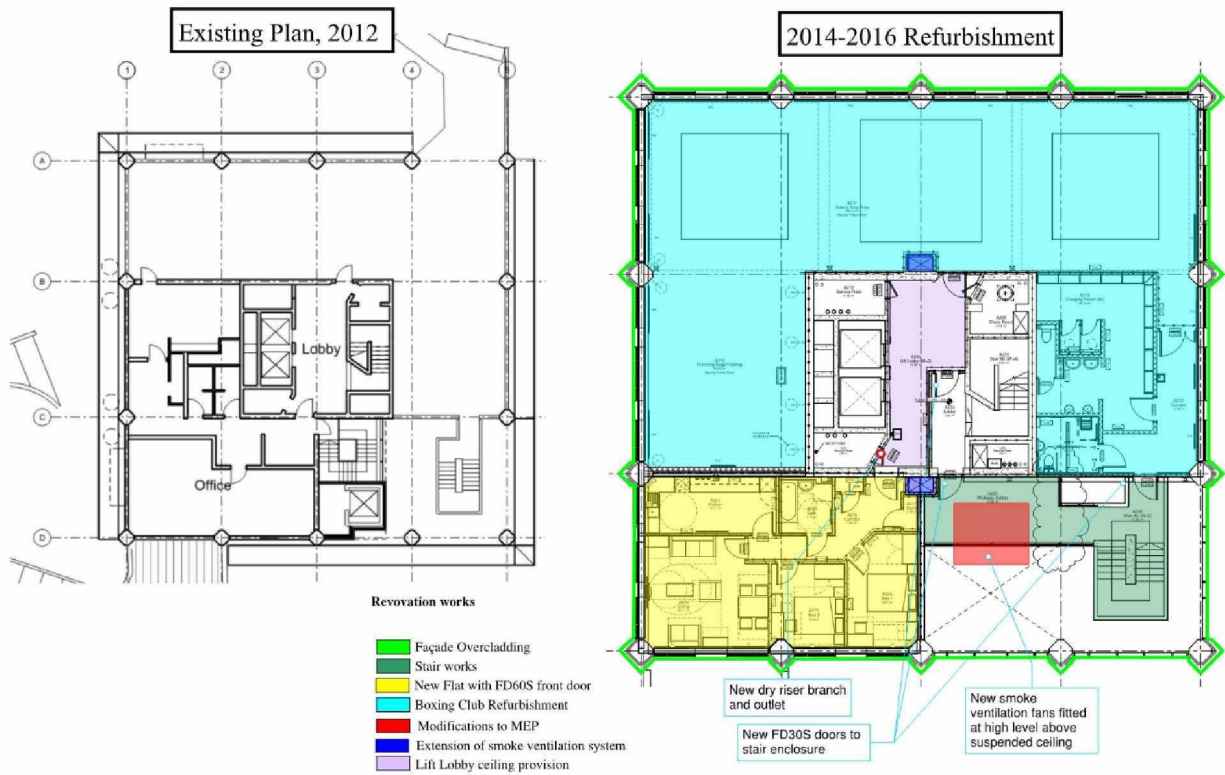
Level 2 – refurbishment plan and existing 2012 plan (MAX00000879, SEA00003149)
